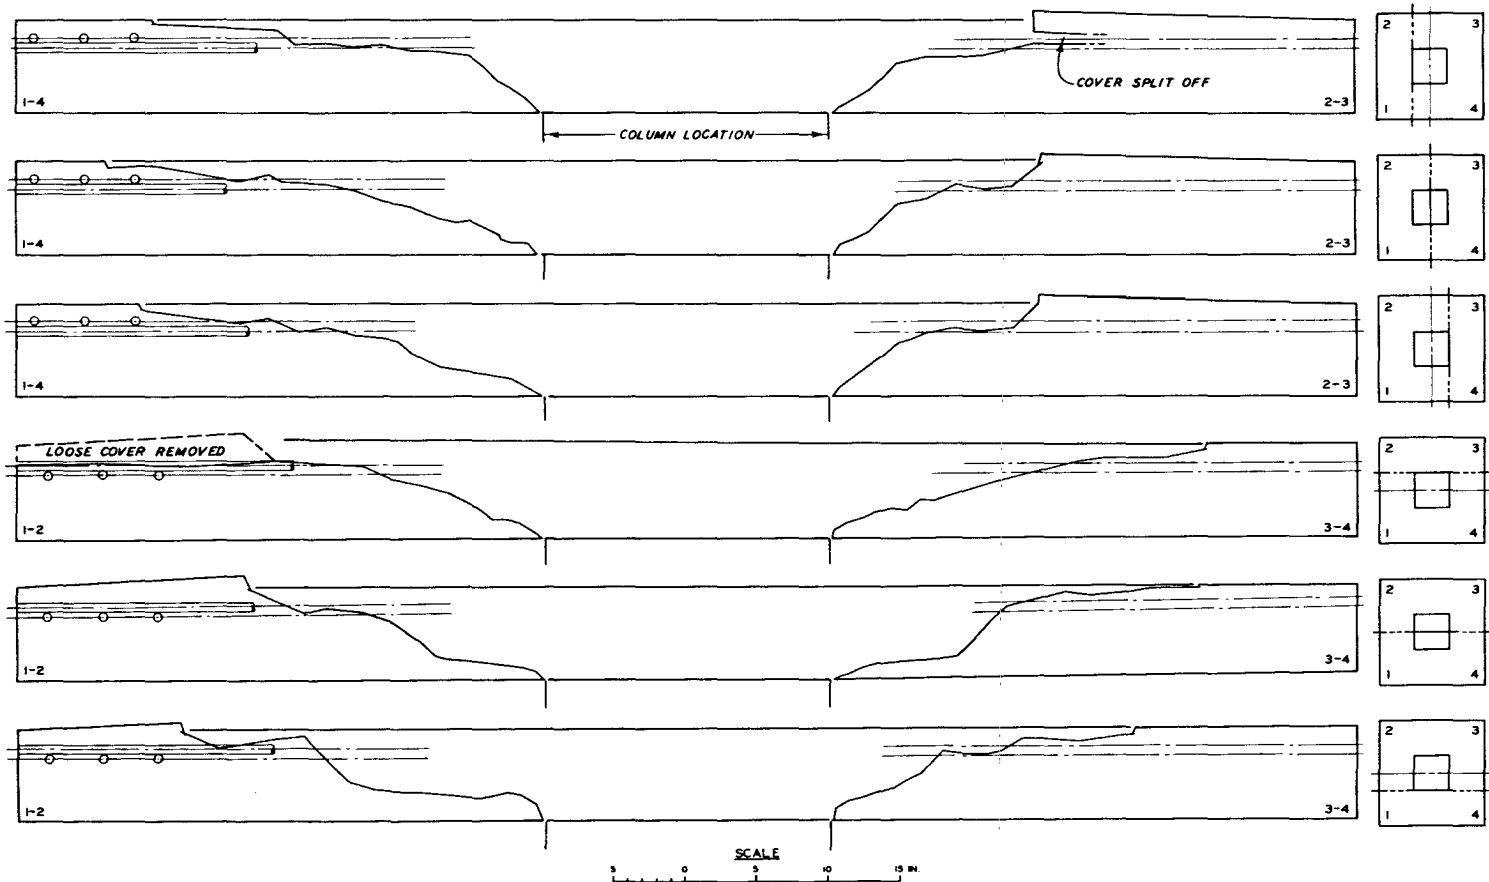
Profiles of slab failure surface, Specimen S4150-1.
